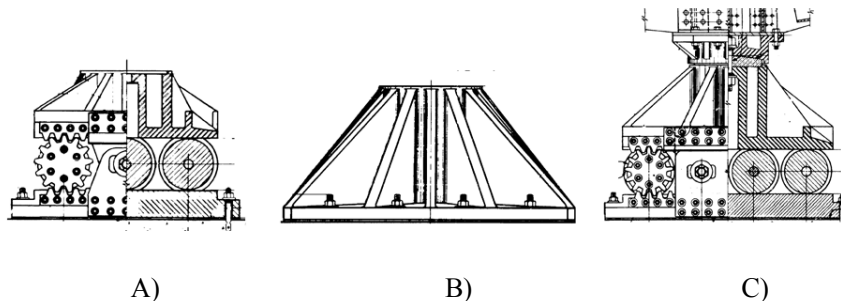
Bearings assemblies for each pier. A) Pier 5 and 8; B) Pier 7; C) Pier 6
